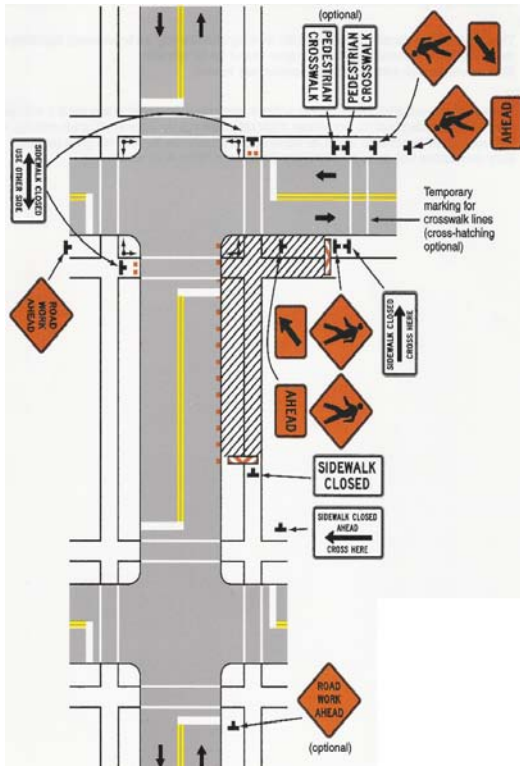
A sample signage plan to assist pedestrians using detours in construction zones. Adapted from Sample Signage Plan for Temporary Pedestrian Closure (MUTCD, Figure 6H - 29).
